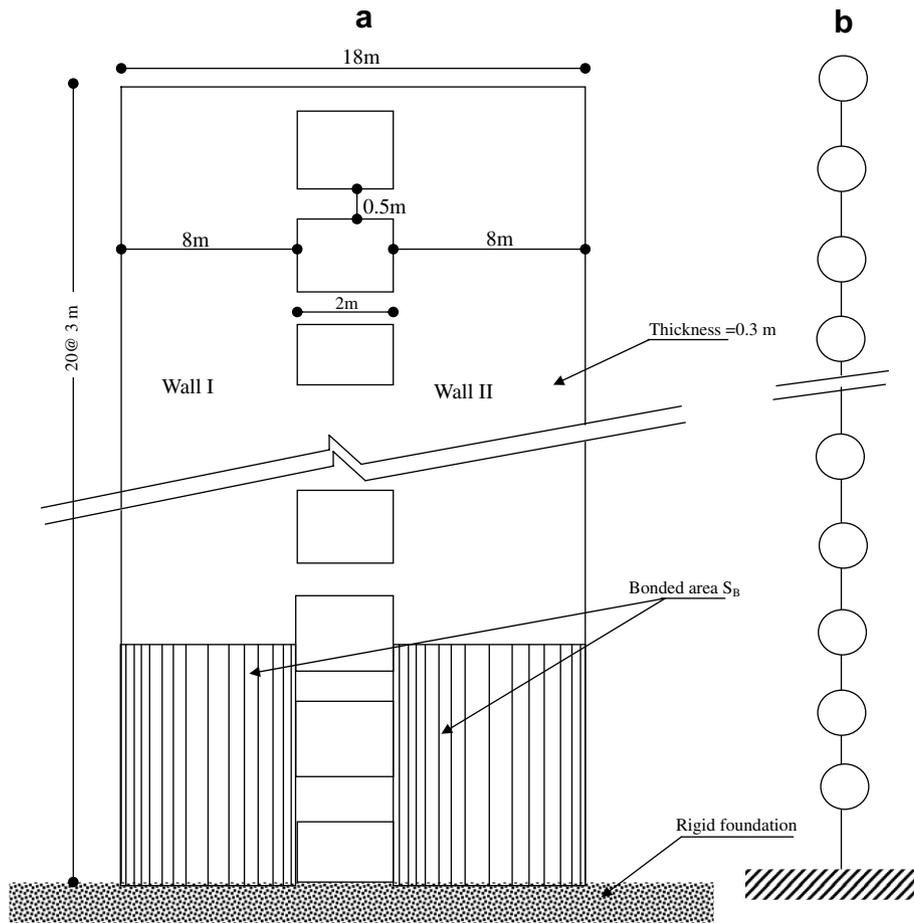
(a) Strengthened coupled shear wall considered in the parametric study. (b) Lumped mass model for coupled shear walls.
